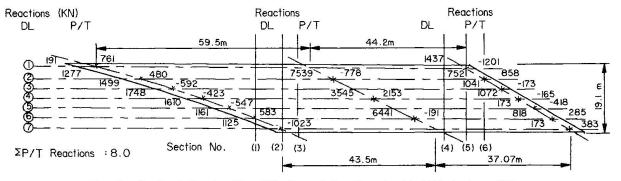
Sectional Framing Plan With Support Reactions for Euclid/Park Ave. Bridge
